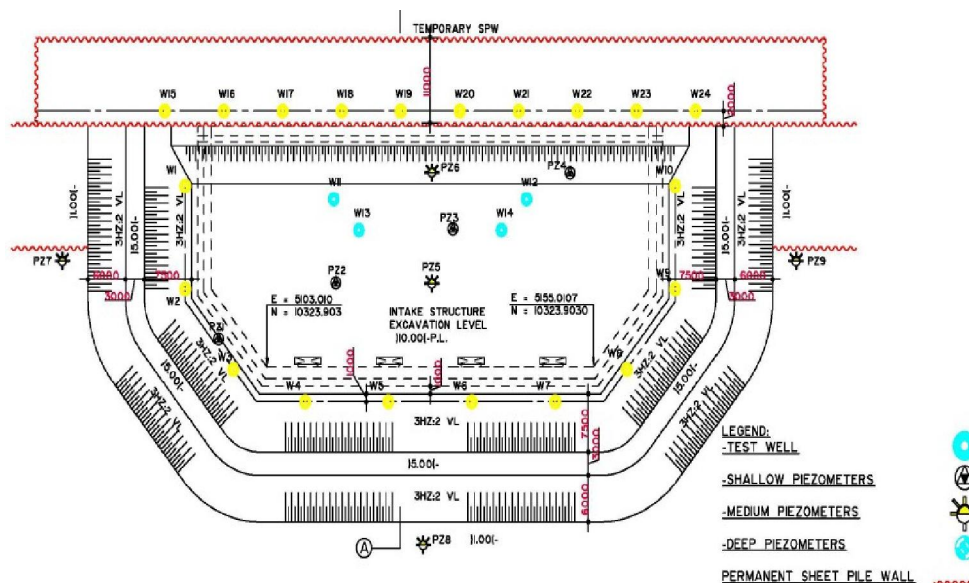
Dewatering and monitoring wells and piezometers arrangement layout for intake structure
